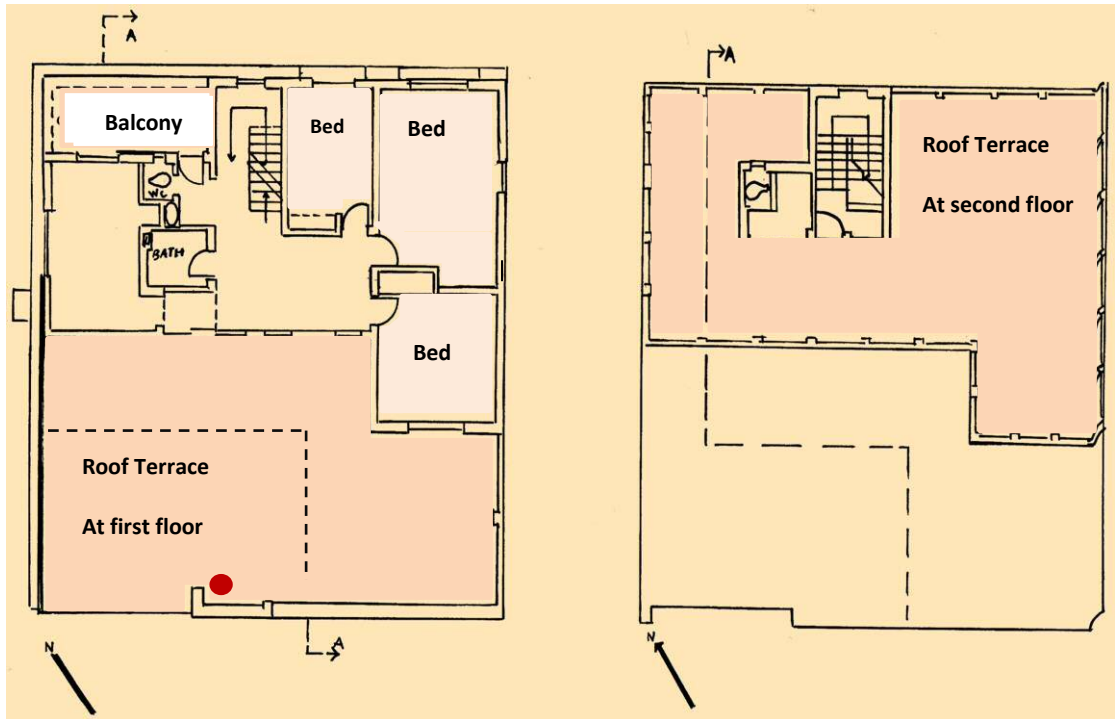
First floor level plan and roof terrace level plan (Researcher) Scale: 1:100
